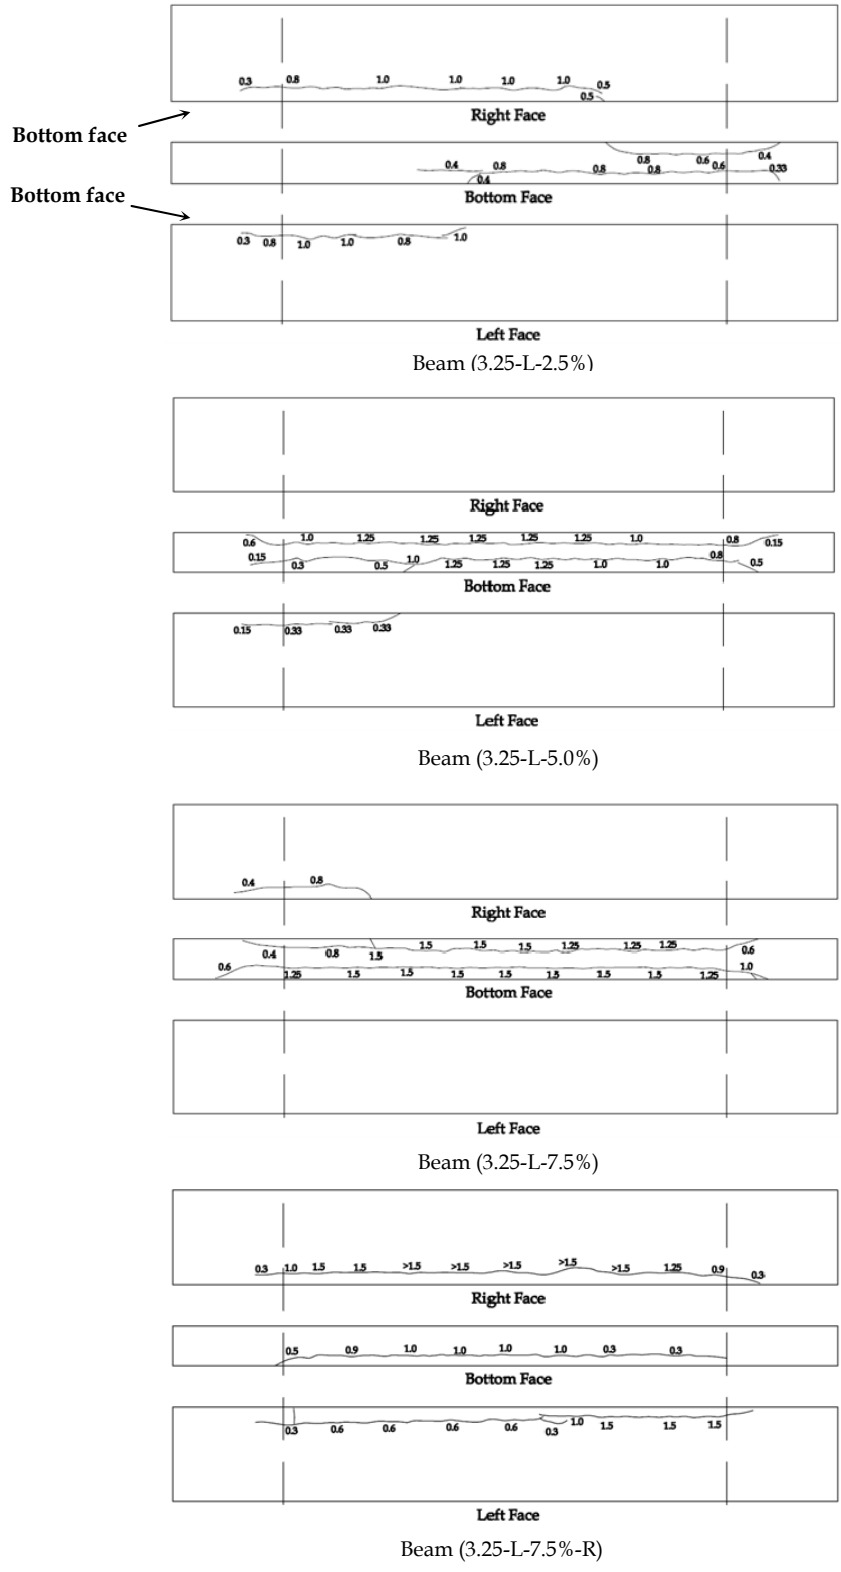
Corrosion crack patterns and crack widths of slender beams without stirrups
